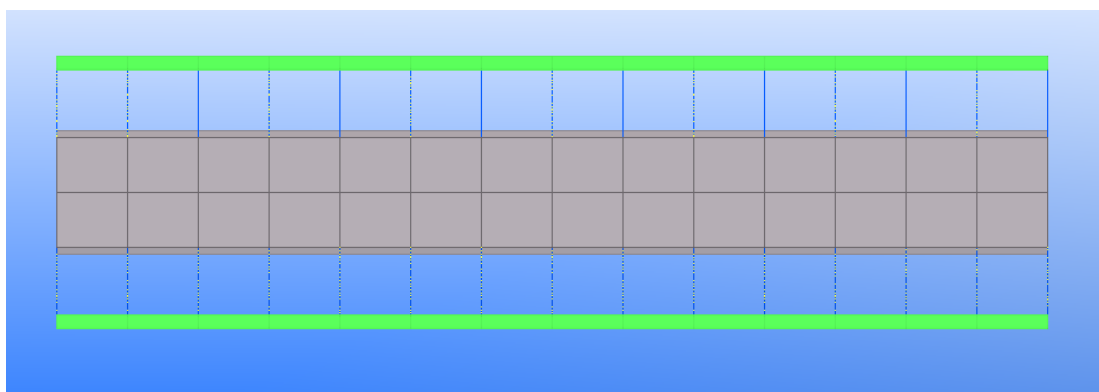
Plan view of wing, support and deck configuration plan view for several sections.
